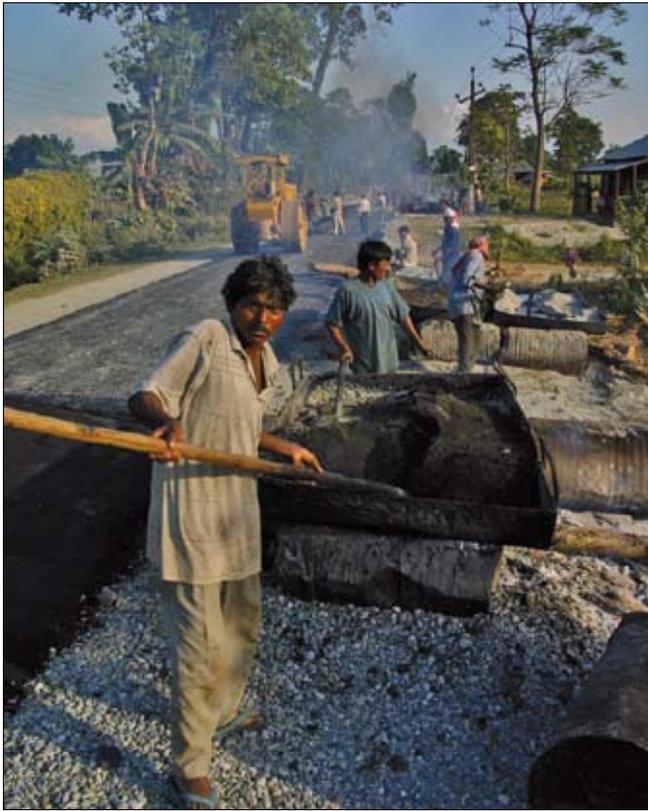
Inner Line Permit? What Inner Line Permit? Migrant laborers on a road construction site, Lohit District, Arunachal Pradesh (photo: Christian Erni)
